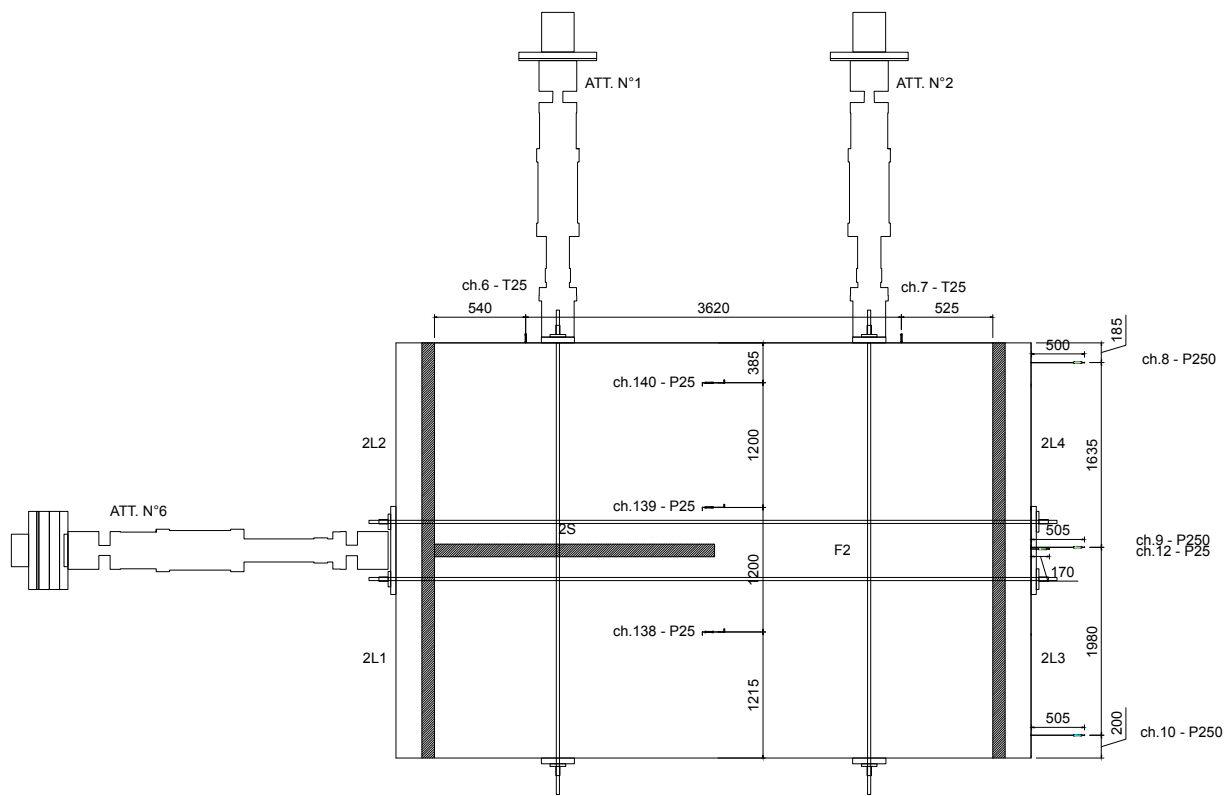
Schematic of the installed instrumentation: top view of the specimen – Floor Slab, 2.
